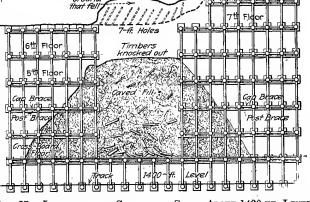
LONGITUDINAL SECTION OF STOPE ABOVE 1400-FT. LEVEL THAT CAVED FOR A LENGTH OF 30 FT., A WIDTH OF 32 FT. AND A HEIGHT OF 50 FT. BETWEEN CHUTES Nos. 30 AND 32
